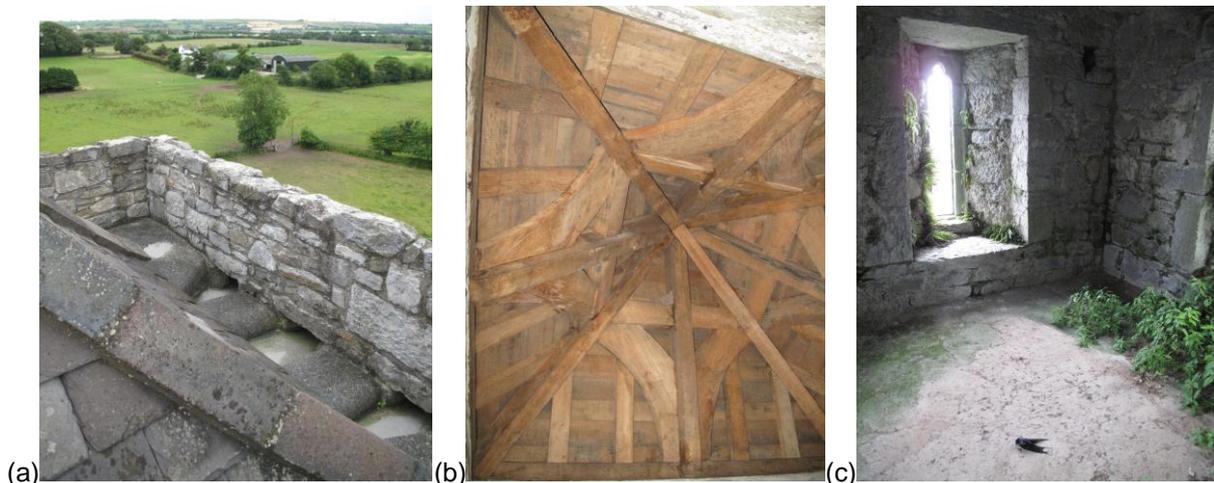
(a) Pyramid roof with waterstone wall walk; (b) Timber roof structure; (c) Unrestored top room of south-eastern turret
